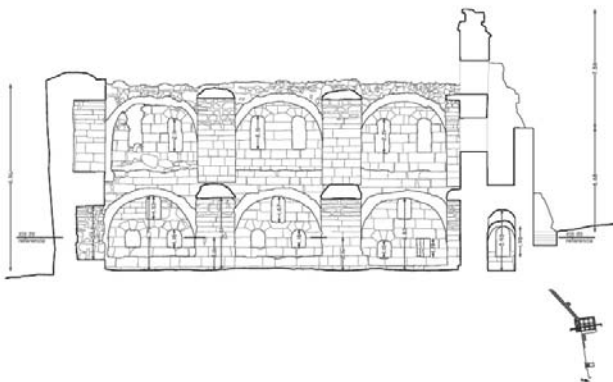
Metric lifting. Example of a longitudinal section where the construction of the buildings is observed.
